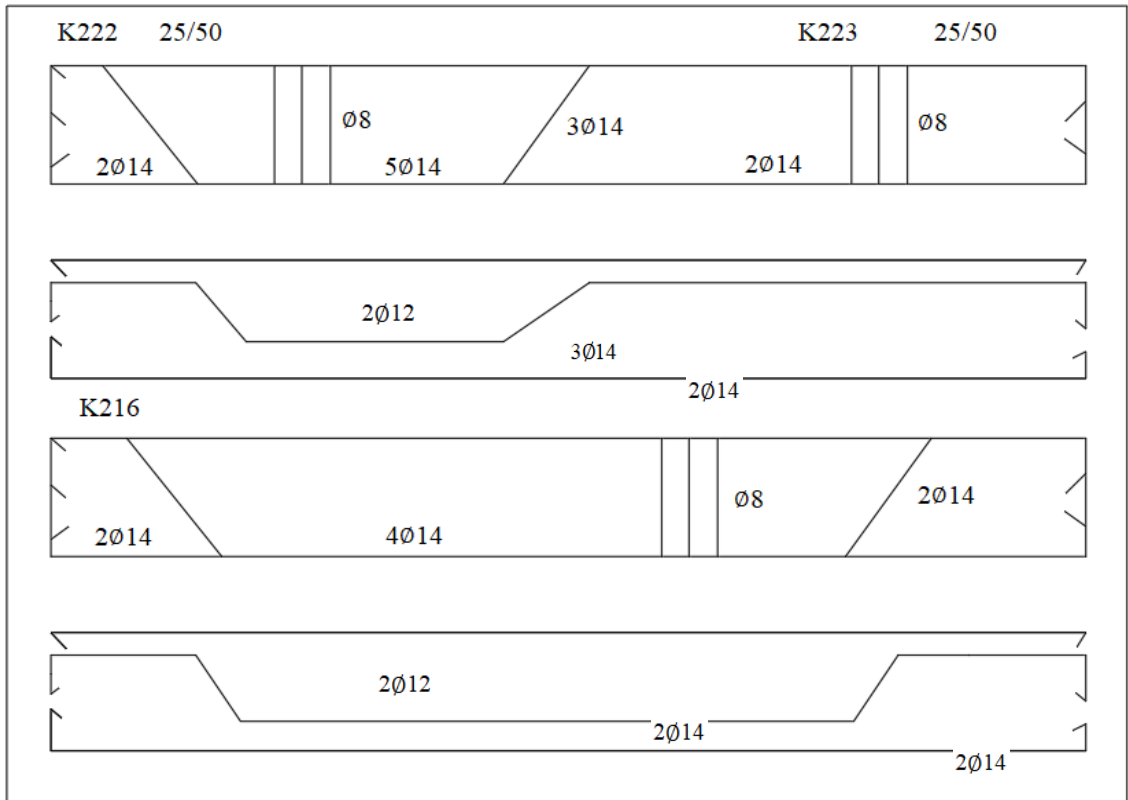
Reinforcement rebar of beams of studied building (K222, K221 and K216)
